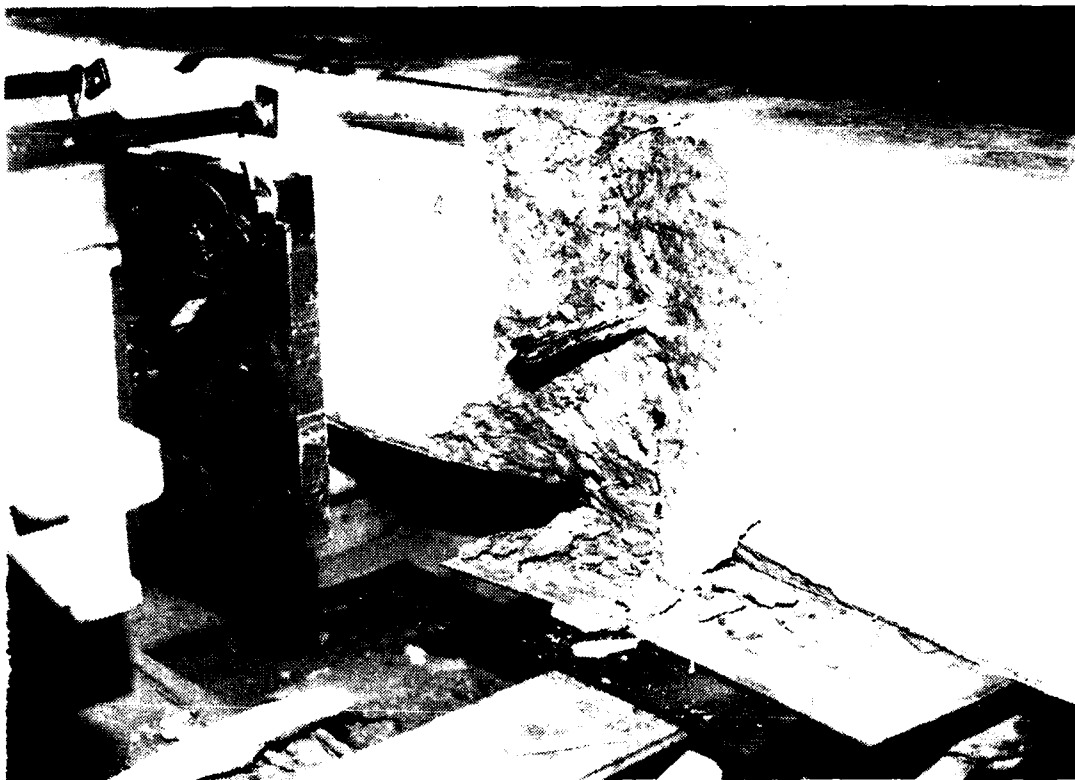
MK14A compression spalling at failure monotonic load at 7 feet from support.
